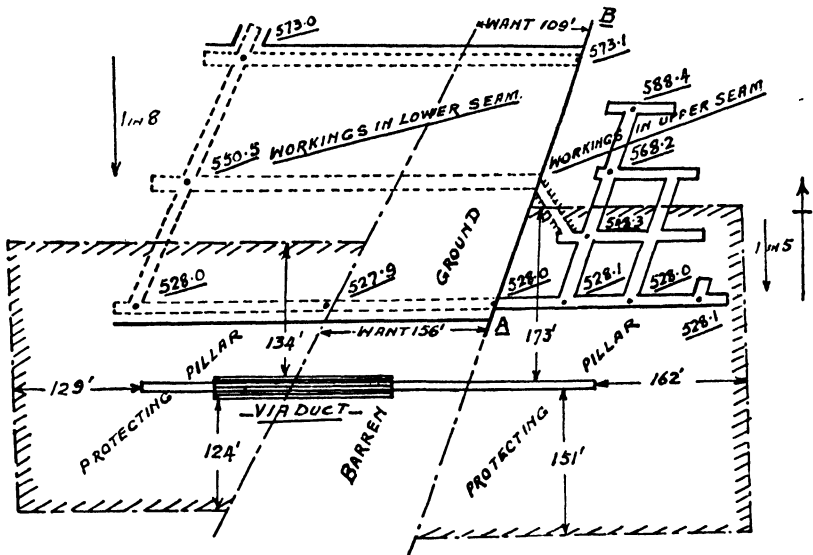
Plan of Workings showing Protecting Barrier for Viaduct.
